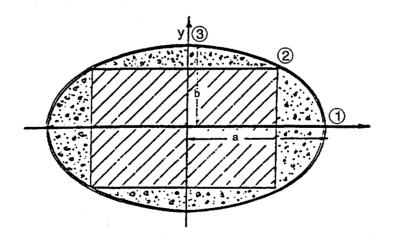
Elliptical jacket column retrofit (from ref. 18).
